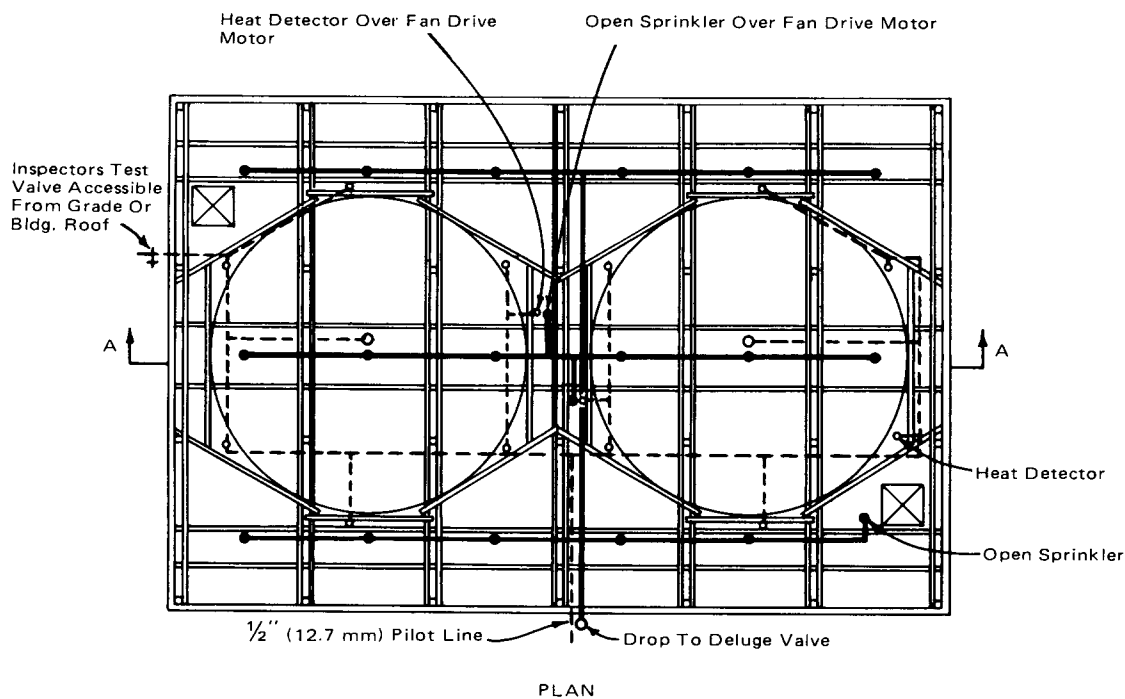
(a) Typical deluge fire protection arrangement for counterflow towers.
